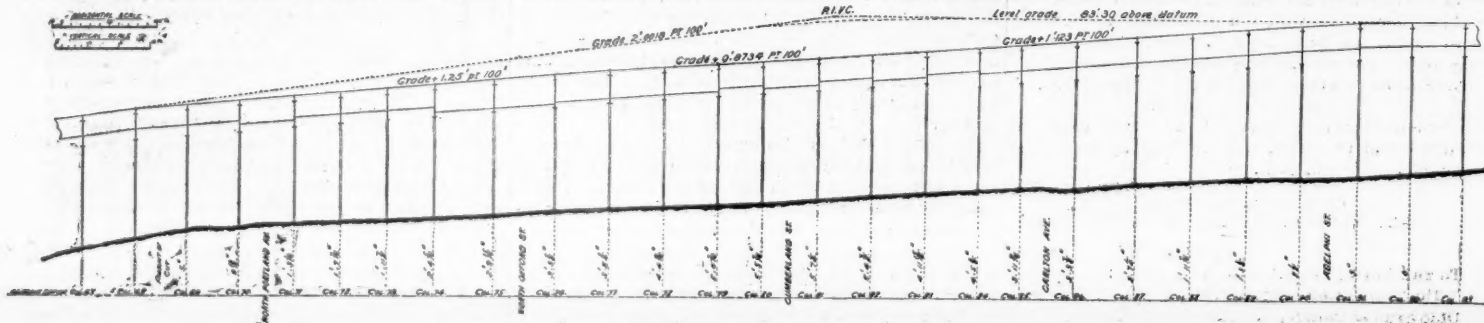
Profile of the Brooklyn Elevated Railroad on Myrtle Avenue.
